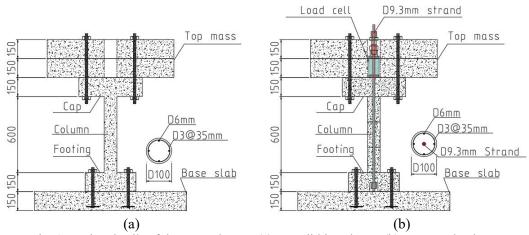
Design details of the two columns: (a) monolithic column, (b) segmental column.
